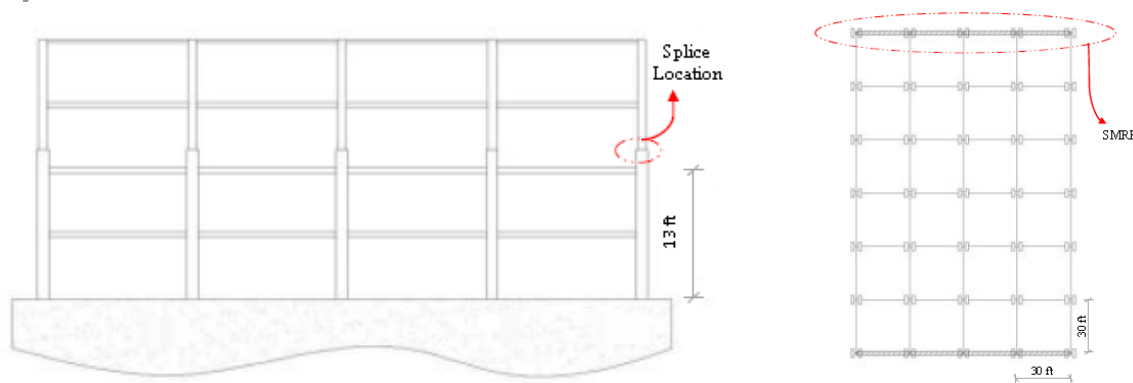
Plan and Elevation Sketch of Archetype Frame, modified from [18]
